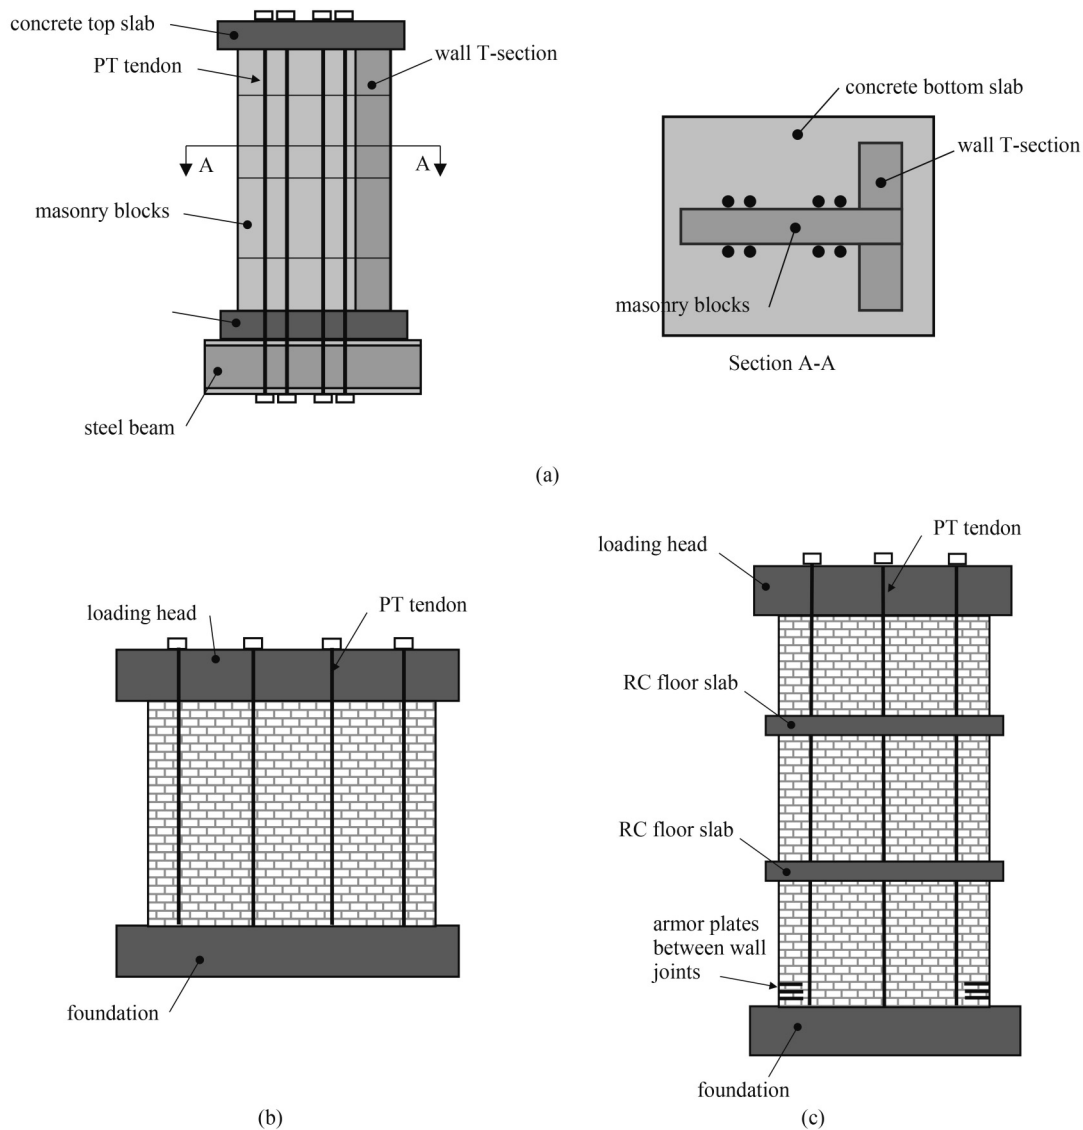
Masonry PT walls: (a) high-strength Calcium Silicate Element masonry rectangular and flanged shear wall adapted from van der Meer et al. [80] (Reprinted from *Engineering Structures*, 49, van der Meer L J, Martens D R W, Vermeltfoort A T, UPT rectangular and flanged shear walls of high-strength CASIEL-TLM masonry: Experimental and numerical push-over analysis, 628–642, Copyright 2013, with permission from Elsevier.); (b) unbonded post-tensioned masonry shear wall adapted from Hassanli et al. [81] (Used with permission of American Society of Civil Engineers, from *Experimental investigation of in-plane cyclic response of unbonded posttensioned masonry walls*, Hassanli R, ElGawady M A, Mills J E, 142, 5, 2016, permission conveyed through Copyright Clearance Center, Inc.); (c) PT masonry wall with armour plates at wall toes adapted from Laursen and Ingham [83] (Used with permission of American Society of Civil Engineers, from *Structural testing of large-scale posttensioned concrete masonry walls*, Laursen P T, Ingham J M, 130, 10, 2004, permission conveyed through Copyright Clearance Center, Inc.).
